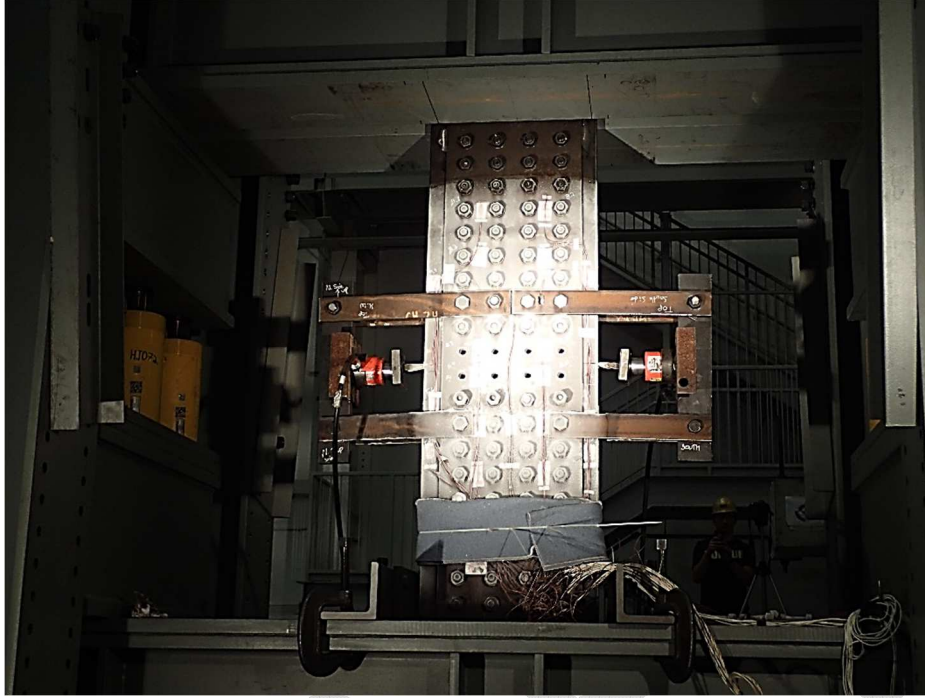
Fracture specimen with hydraulic rams and wedges in place
